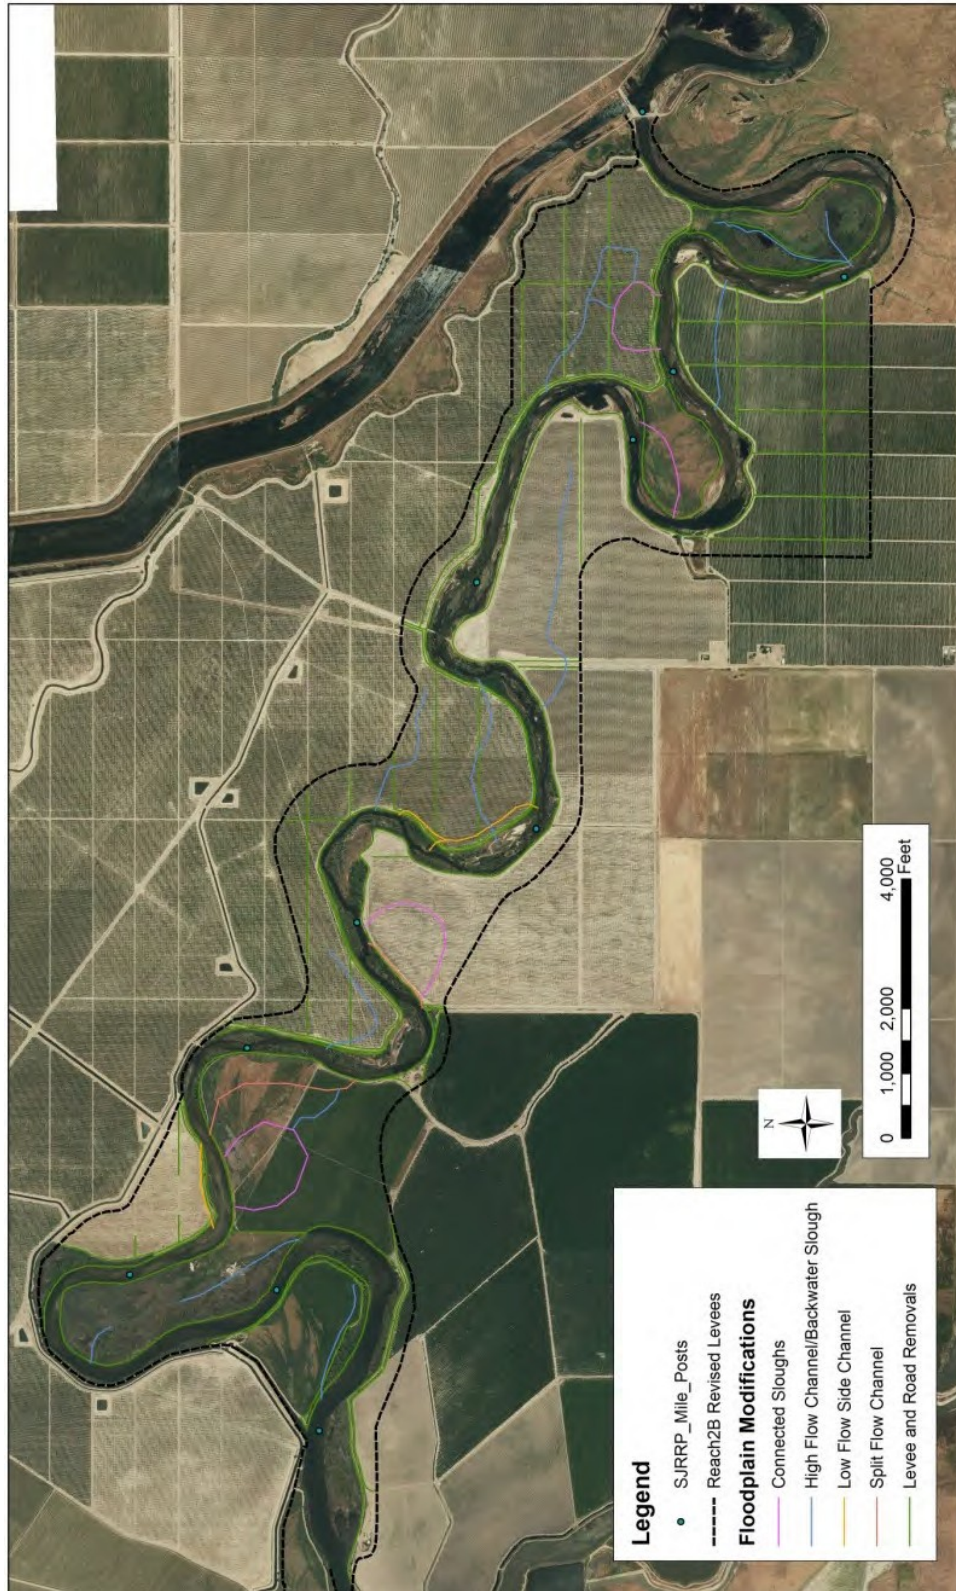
Example Floodplain Grading Approach – Plan View. (Pg. 2-25, Figure 10, Reclamation BA)
